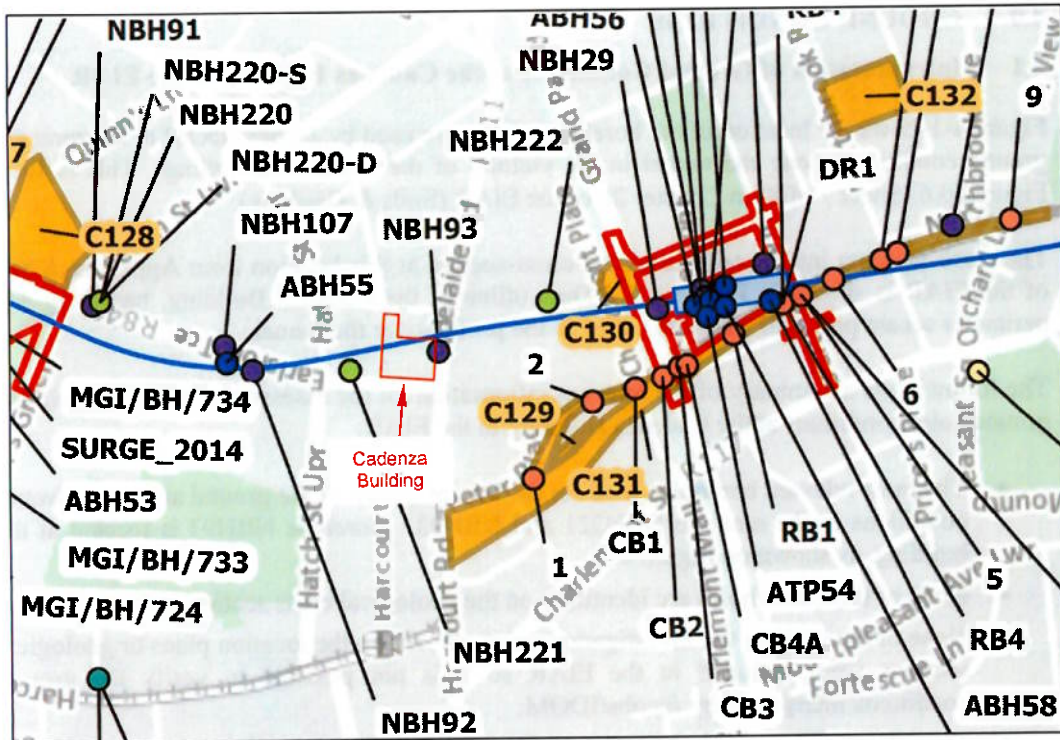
Site Investigation Location Plan [from Figure 20.6 (Sheet 7 of 8) in Chapter 20 of the EIAR]
